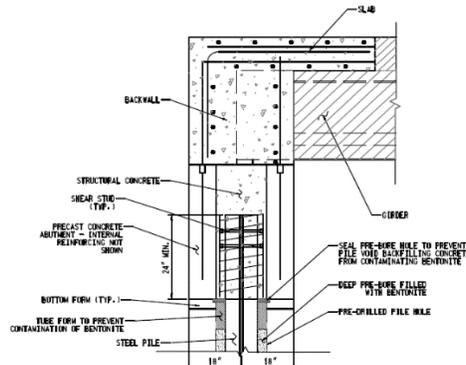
67 Precast integral abutment connection to steel pile [8].
